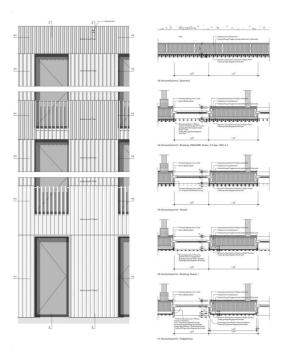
TWIST Studentisches Wohnen Facade and Concept Source: Architektick
